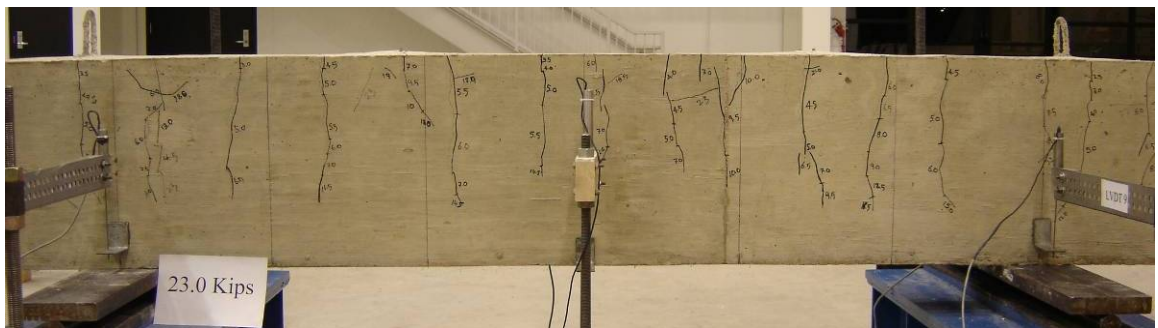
Cracking Pattern of Carbon FRP Reinforced Specimen Prior to Failure (Specimen B-PC1-5-24)
